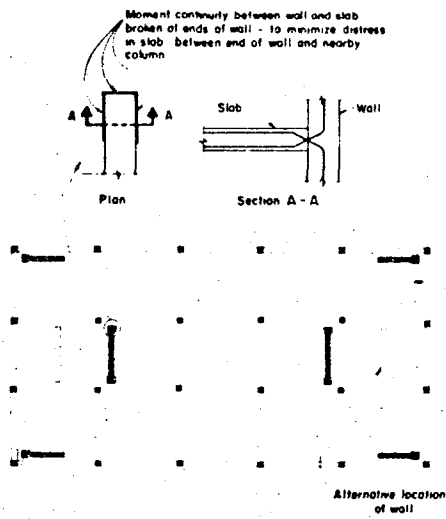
Walls Functioning Primarily as Lateral-Load-Resisting Elements
